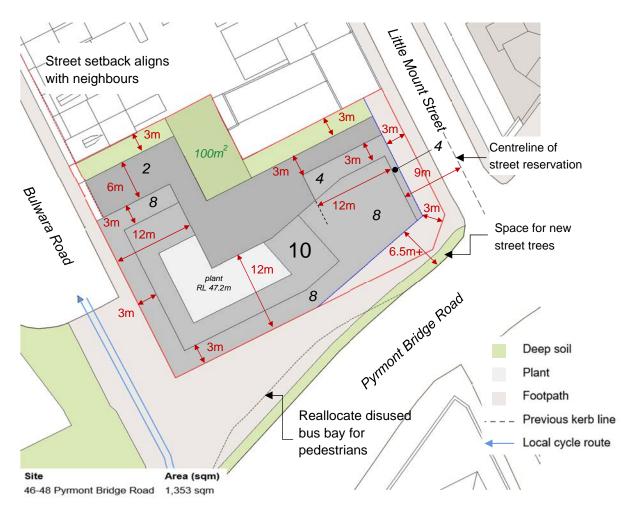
site plan showing mixed use scheme for 46-48 Pyrmont Bridge Road
